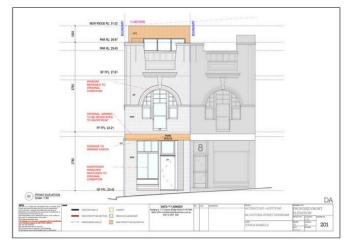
Plan showing approved front elevation to No. 8A Victoria Street. Smith and Carmody, 2021
